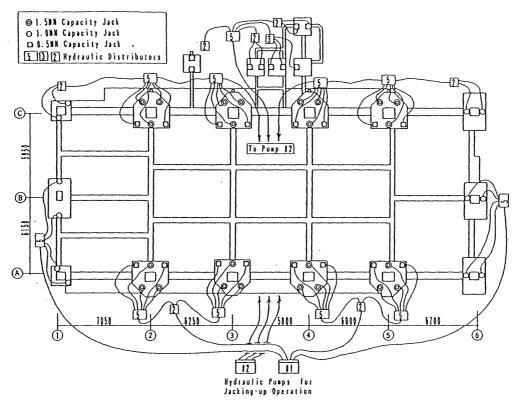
Plan Showing the Hydraulic Layout System and the Location Jacks Utilized in the Jacking-up Operation.
